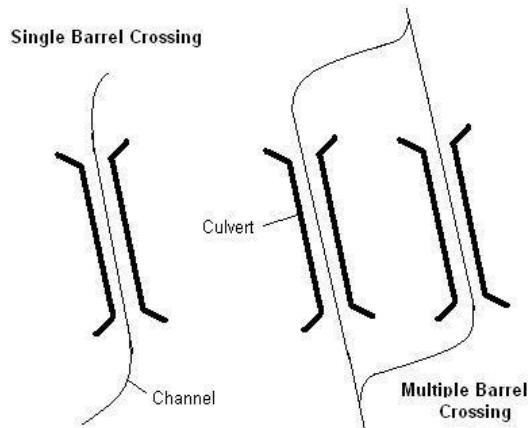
Plan view, or map view with a culvert crossing mark added
